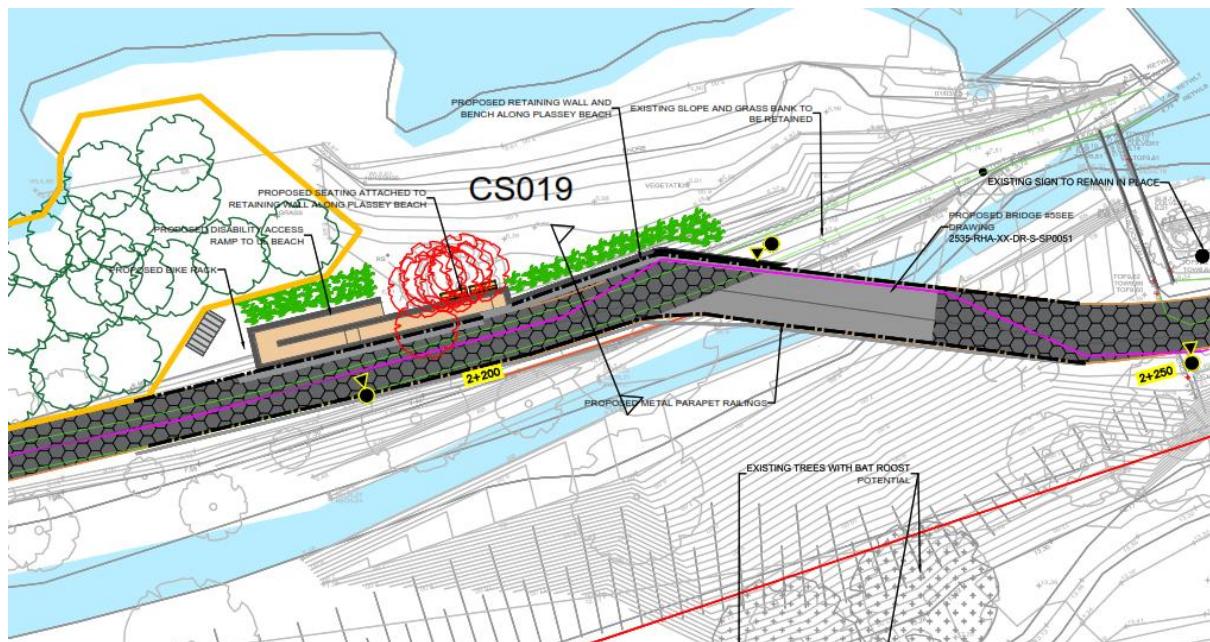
Proposed plan of ramp and Bridge 5 at Plassey Beach
